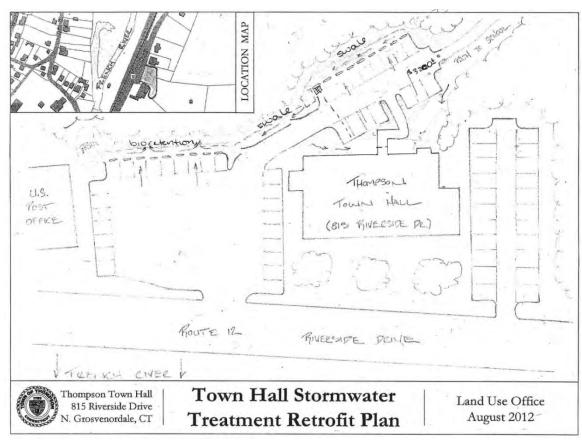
Stormwater retrofit for the Thompson Town Hall parking areas.
